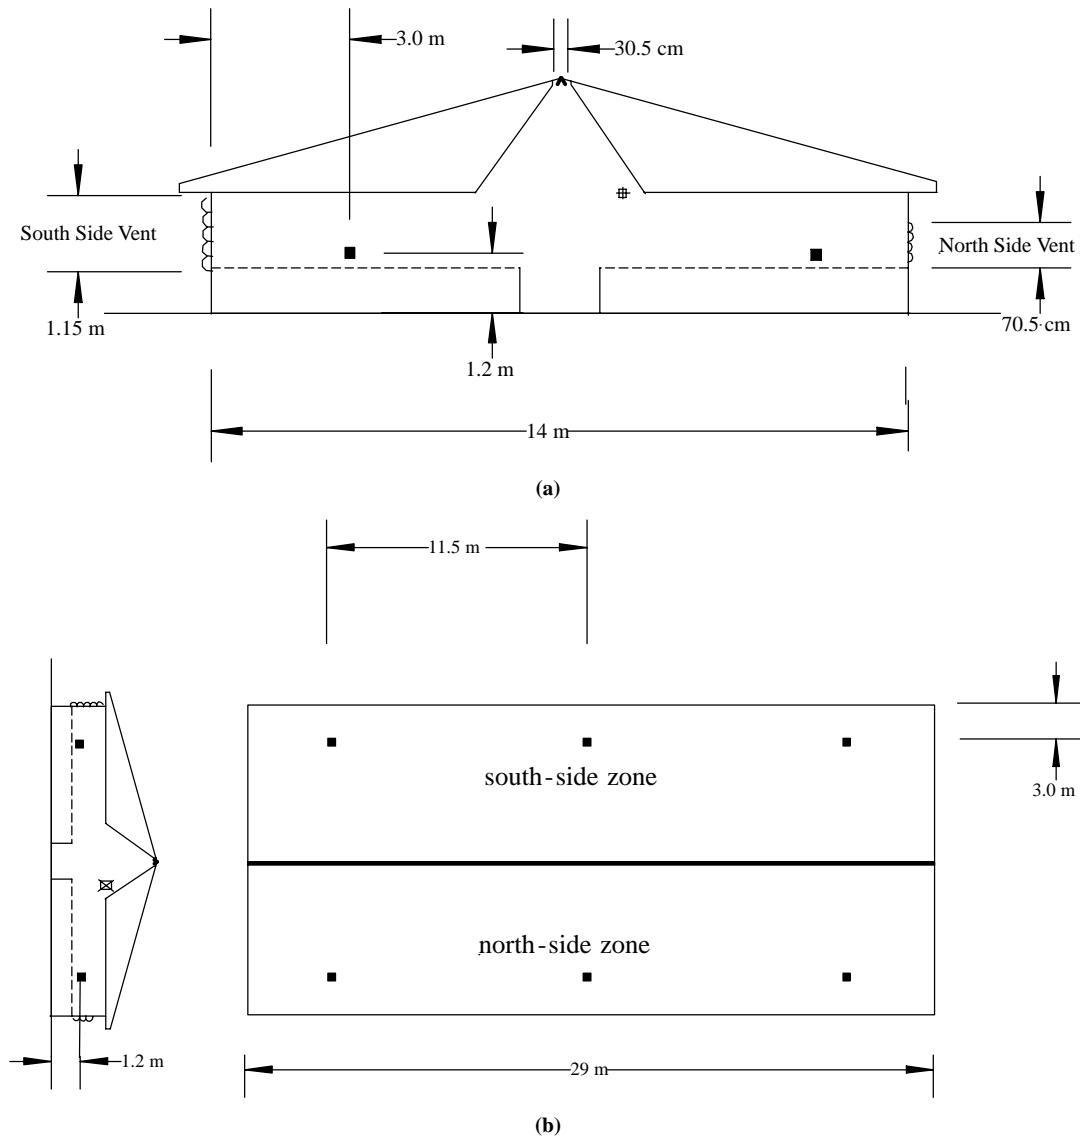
Modifications made to the building to provide independent and automated vent control. (a) NS curtain, SS curtain, and RV provided with automated actuation; NS hinged doors replaced with an insulated curtain. (b) Building volume separated into two control zones; north and south, with each described by the average of three temperature feedback sensors at the locations shown. Cross-hatched box location represents the relative humidity sensor location used for cold weather air quality control.
